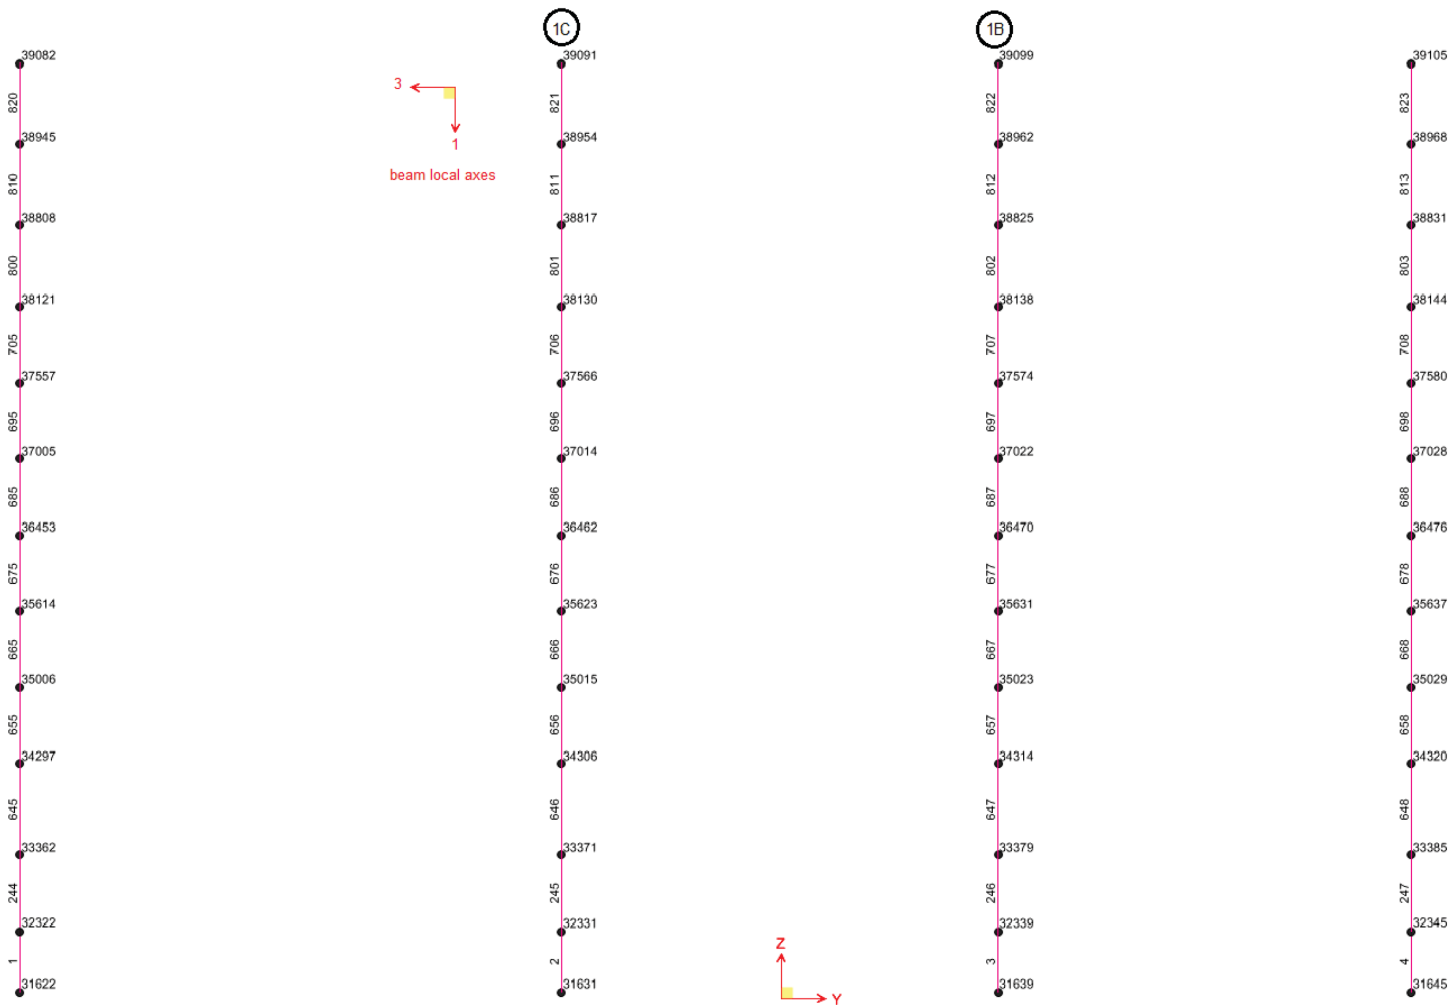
B-80: SAP2000 View and Frame Element Numbers of Pilasters on CRB Grid Line 1 Wall
